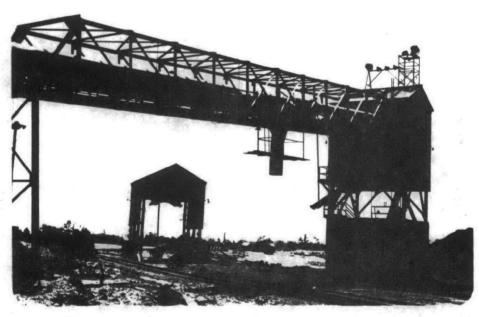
View from ground level facing south showing coal handling facilities. A portion of the coal storage area is also shown.
